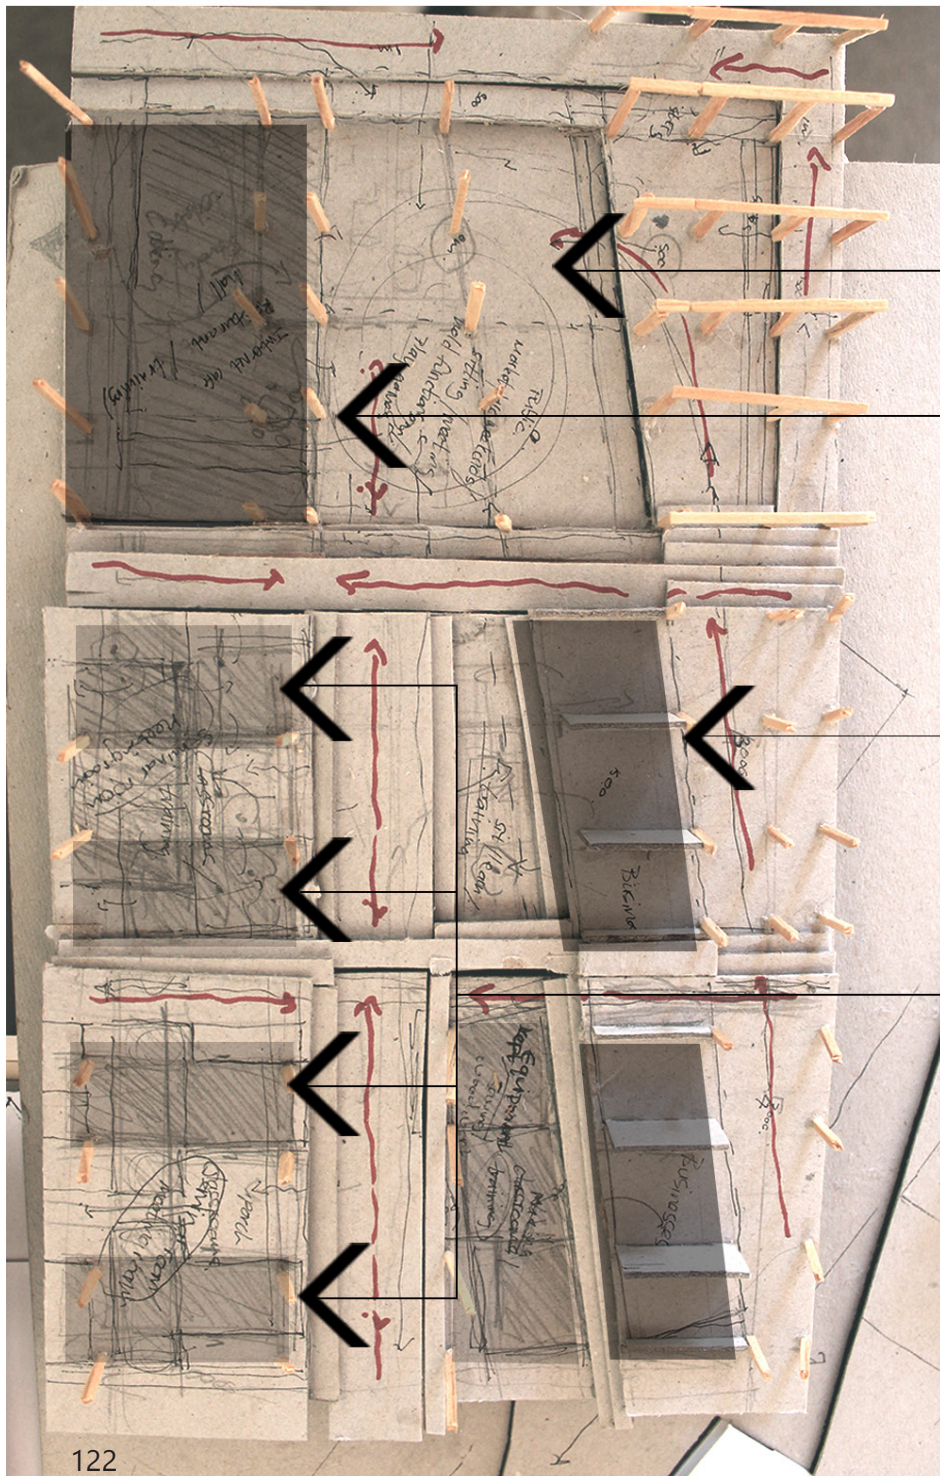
Sketches of proposal 1, Author (April 2016)
